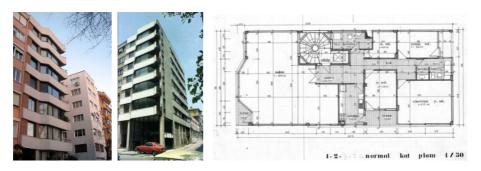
Sungur Apartments, Hüsrev Gerede Street, Teşvikiye, 1978.
